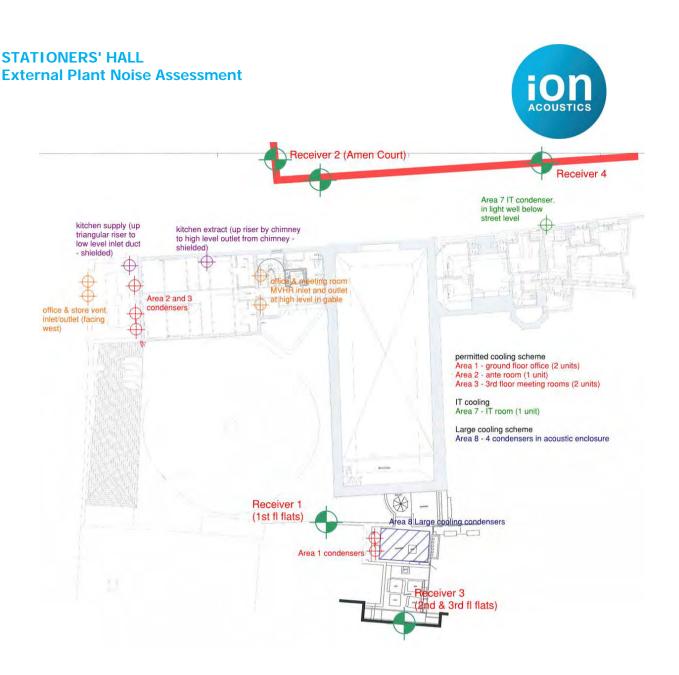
Site Plan with Receptor Locations and approx plant locations
